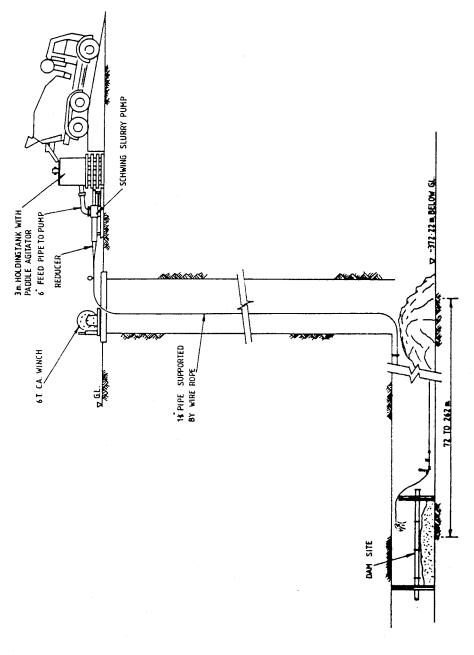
Schematic Arrangement for Placing Concrete Dams at Bolsover Colliery. (23)
